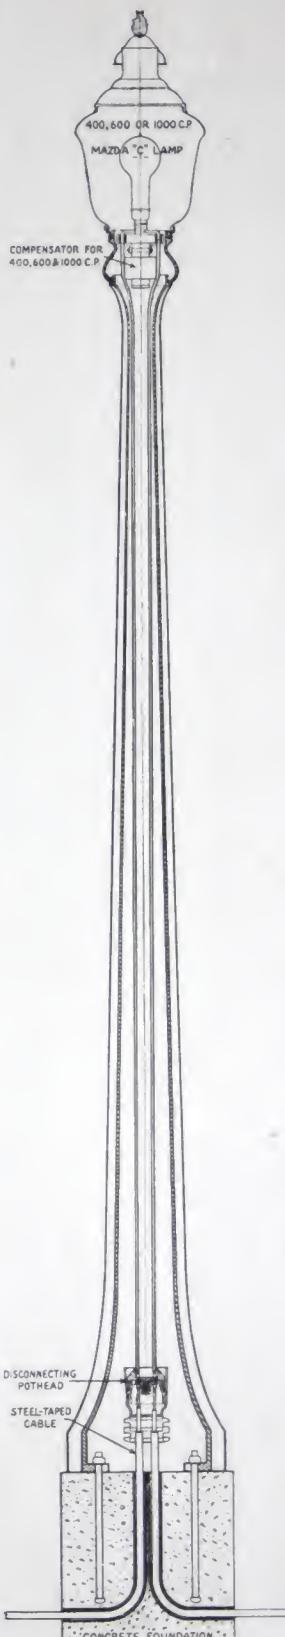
Sectional View of Arcadian Post Showing Pothead in Base
